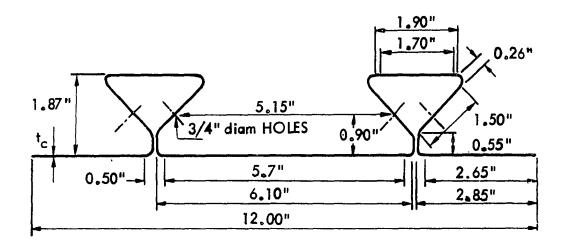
Typical profile of steel deck E (CATEGORY I)
